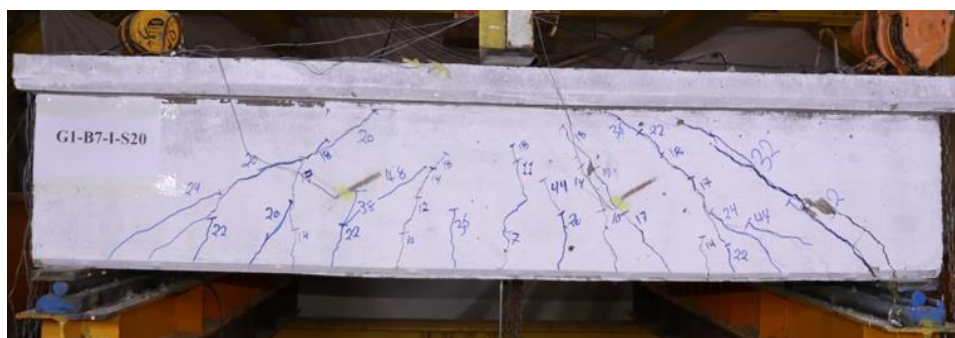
Failure crack pattern of specimen G1-B7-I-S20
